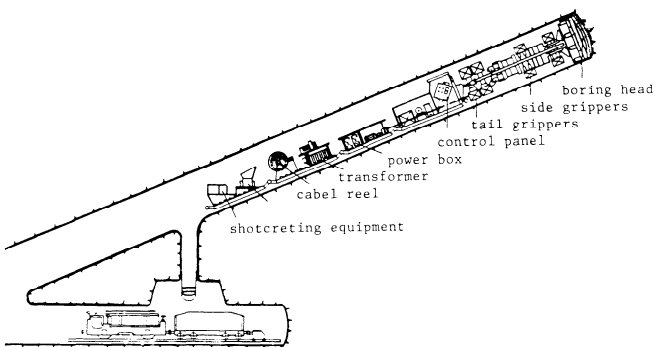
Driving incline with tunneling machine (courtesy: Thyssen Schachtbau Co.).
